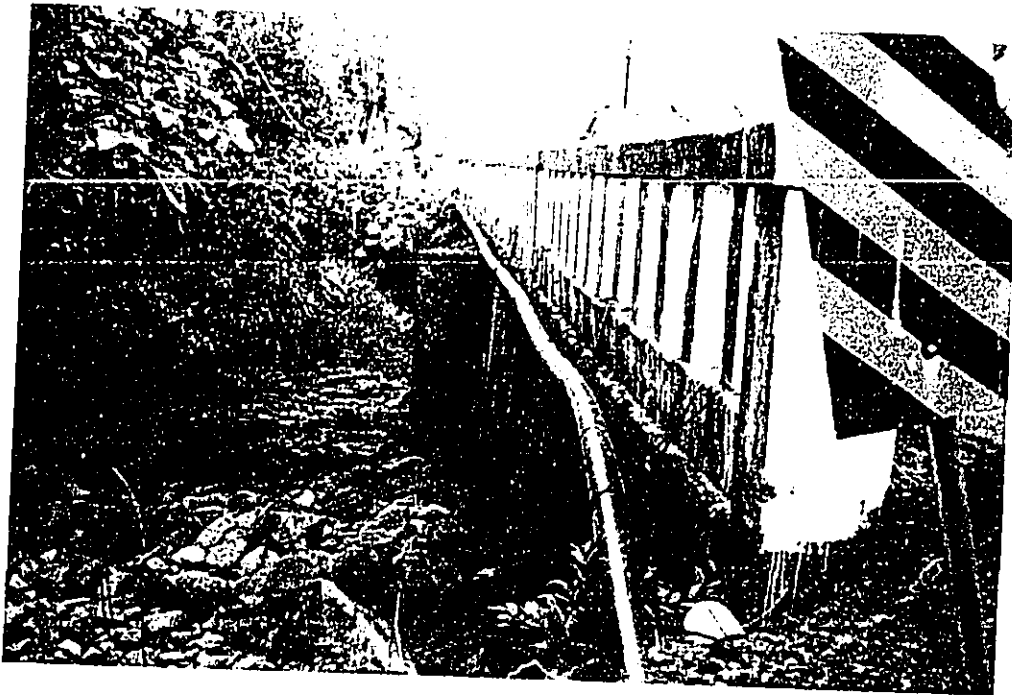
View of the downstream side of Waiohonu Bridge looking north-east towards Hana
